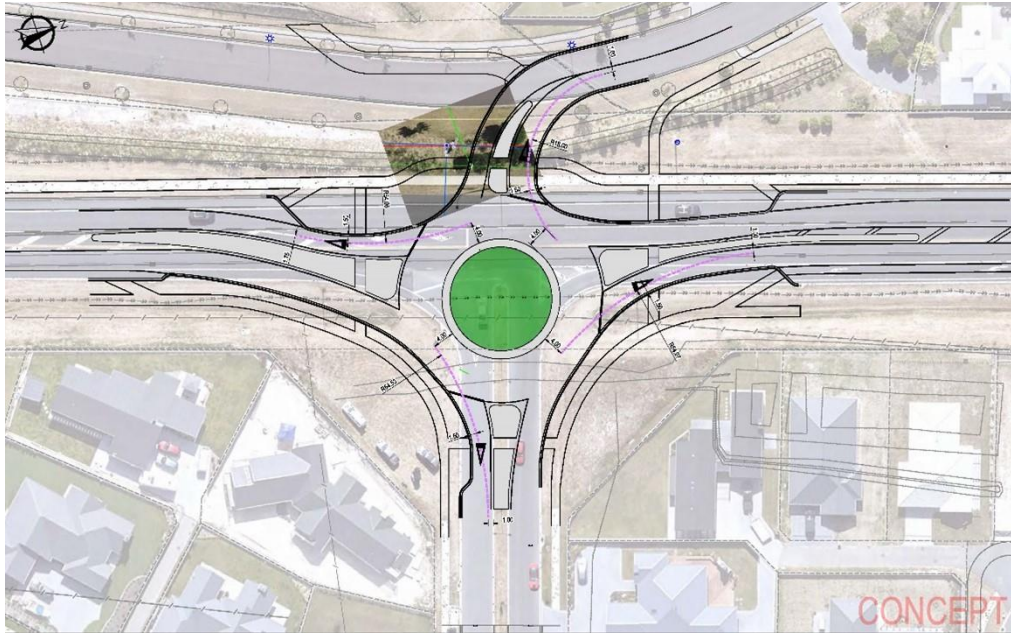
Engineering concept of a new 4-leg roundabout with a direct connection to Pukenamu Drive.
